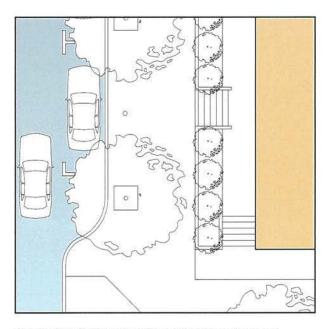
Plan View, Raised Terrace Frontage (Illustrative; canopy roof not shown)
